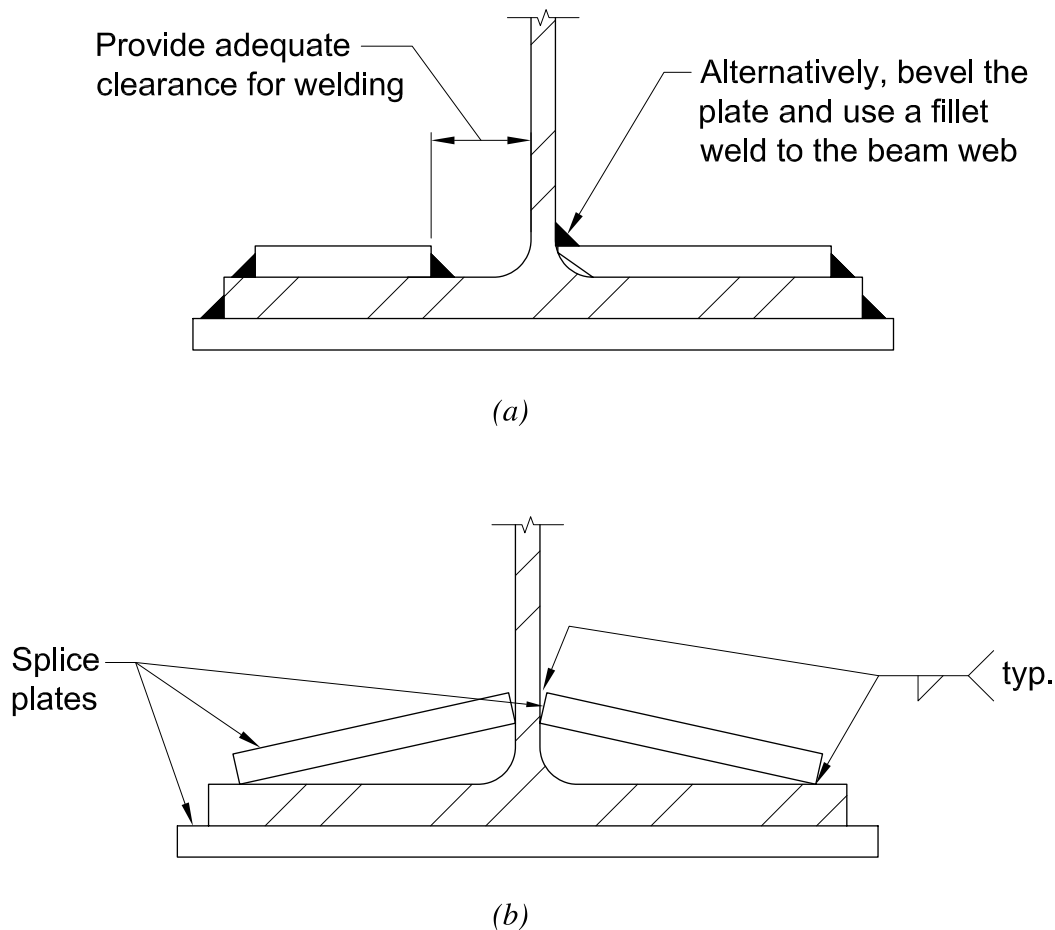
Welding clearances for flange-plated moment splices.
